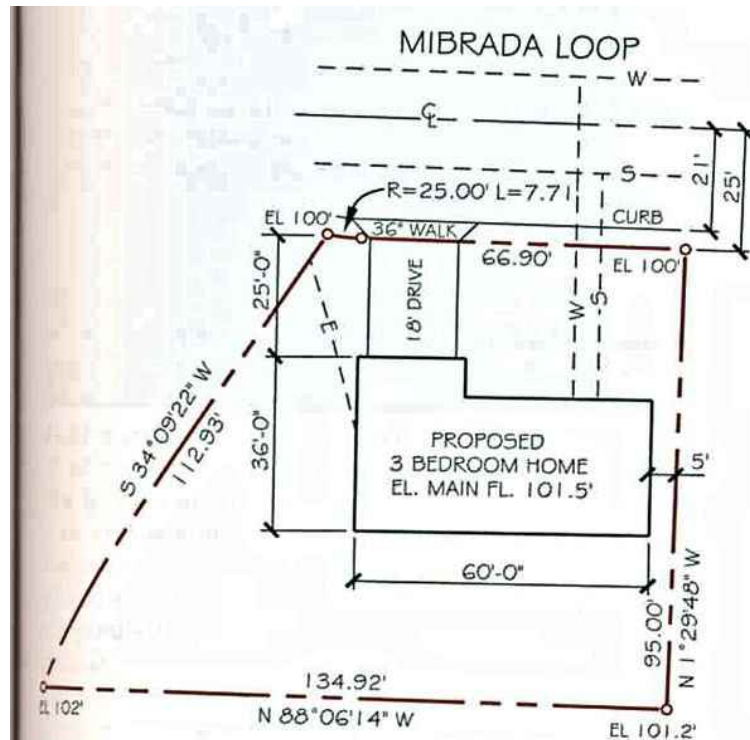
■ Step 5: Add dimensions and elevations; then label all roads, driveways, walks, and utilities.
